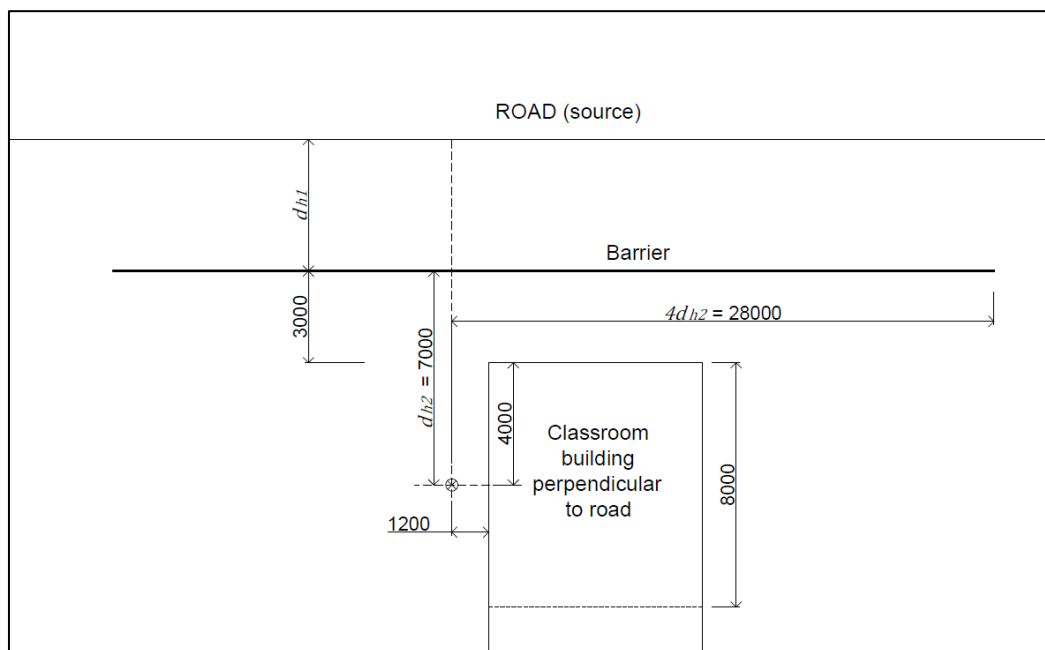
Illustration of determination of barrier length for building perpendicular to road
